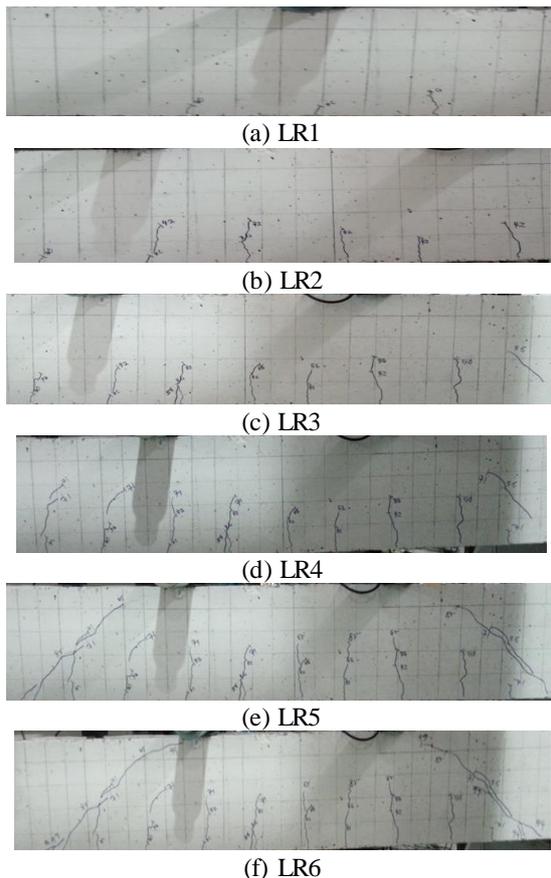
Detailed crack observation during laboratory work; (a) LR1, (b) LR2, (c) LR3, (d) LR4, (e) LR5 and (f) LR6.
